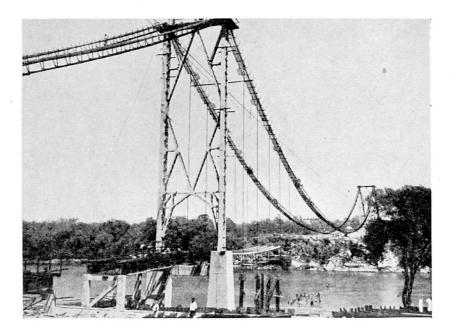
Otto Beit Bridge, Rhodesia. Erection of deck cross girders. Note opening in tower bracing for Blondin on Bridge centre line
